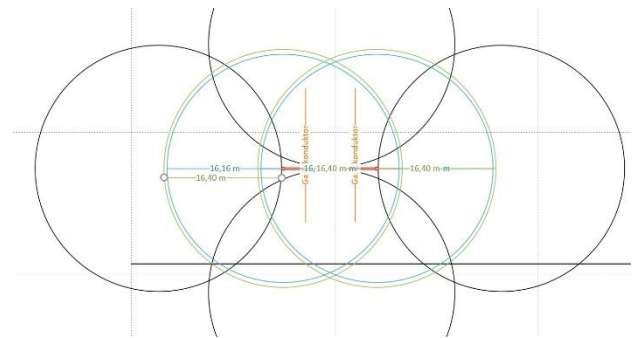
Protection Zone Top View of OCS V-Truss Beam Pole with Striking Distance 34.43 m
